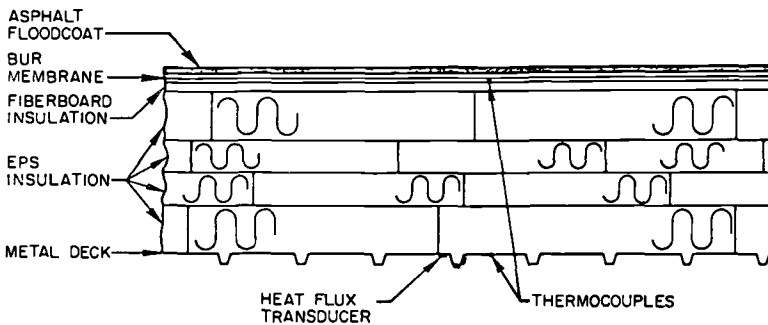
Schematic drawing of the EPS test specimen showing the location of sensors for Experiment 2.
